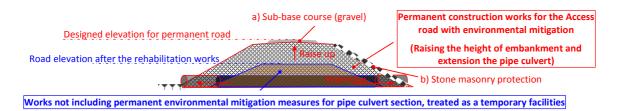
Extension of pipe culvert with mitigation measures by permanent road construction works
